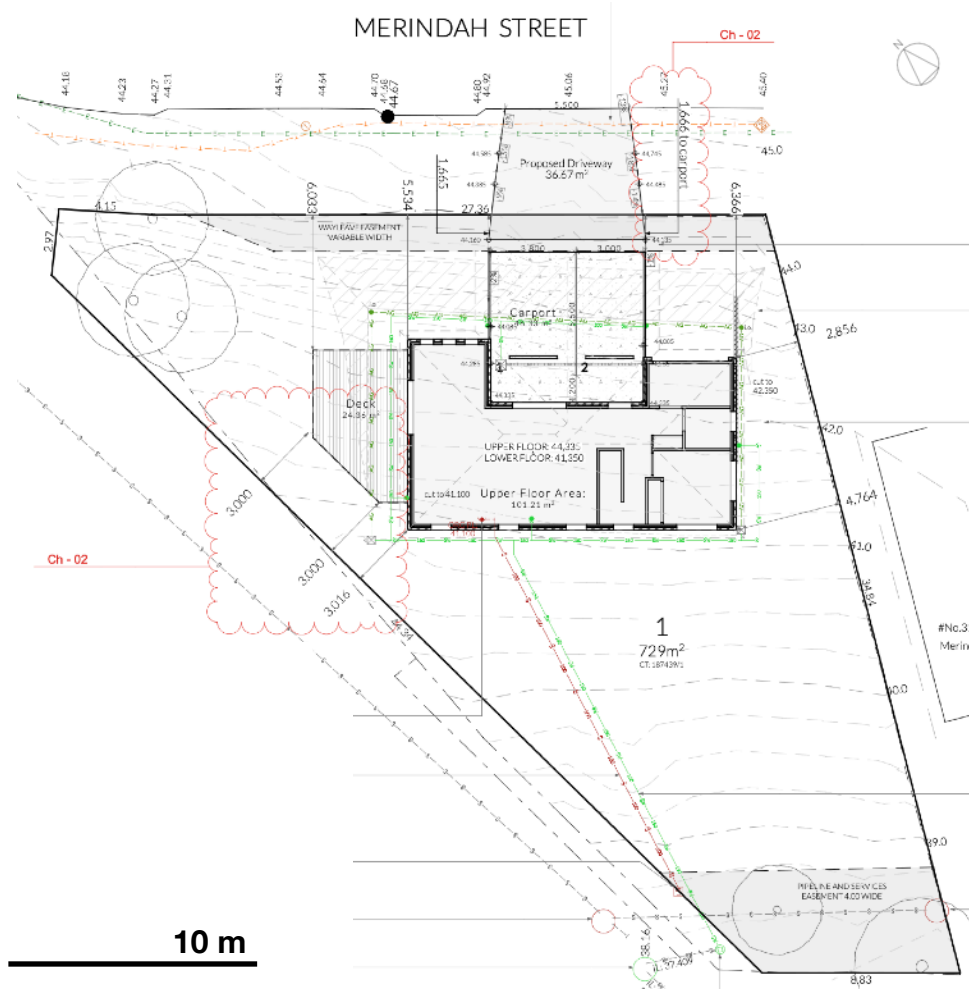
PRELIMINARY PROPOSED SITE PLAN
